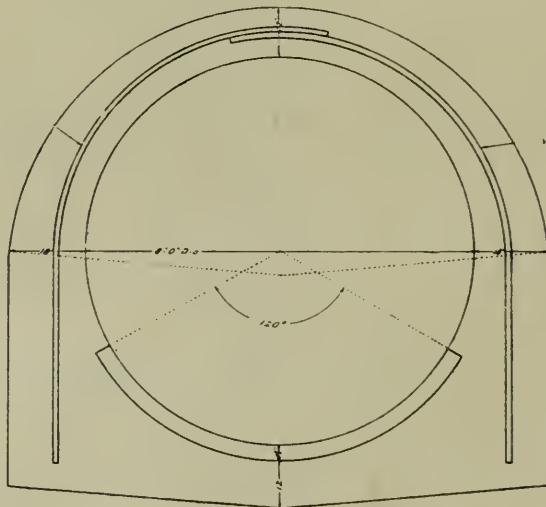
STICKFOOT BRANCH TRUNK-SECTION SHOWING REINFORCEMENT.
